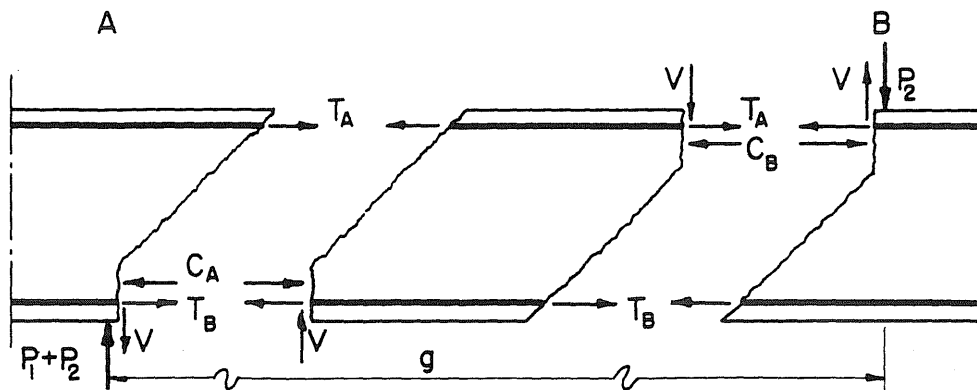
CONTINUOUS TOP AND BOTTOM REINFORCEMENT BOND DESTROYED IN RESTRAINED BEAM WITH TWO CRACKS
